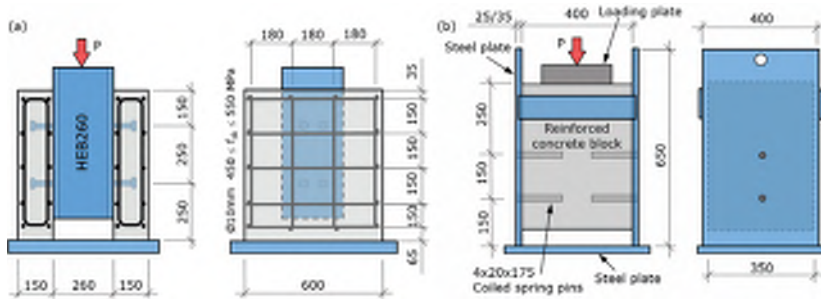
Test(a) Standard push-out specimen from EC4-1-1, (b) Inverted push-out test specimen [mm]
